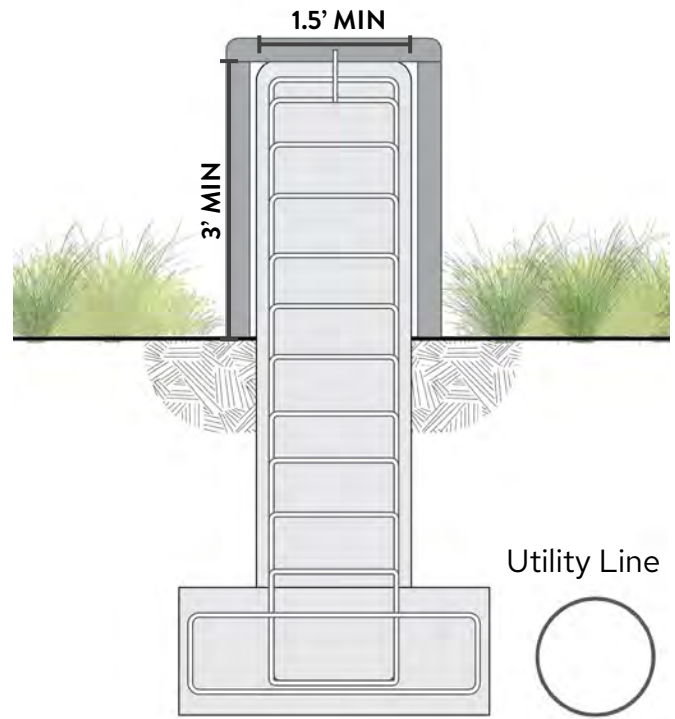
Anti-Ramming Rated Wall with Vertical Foundation
